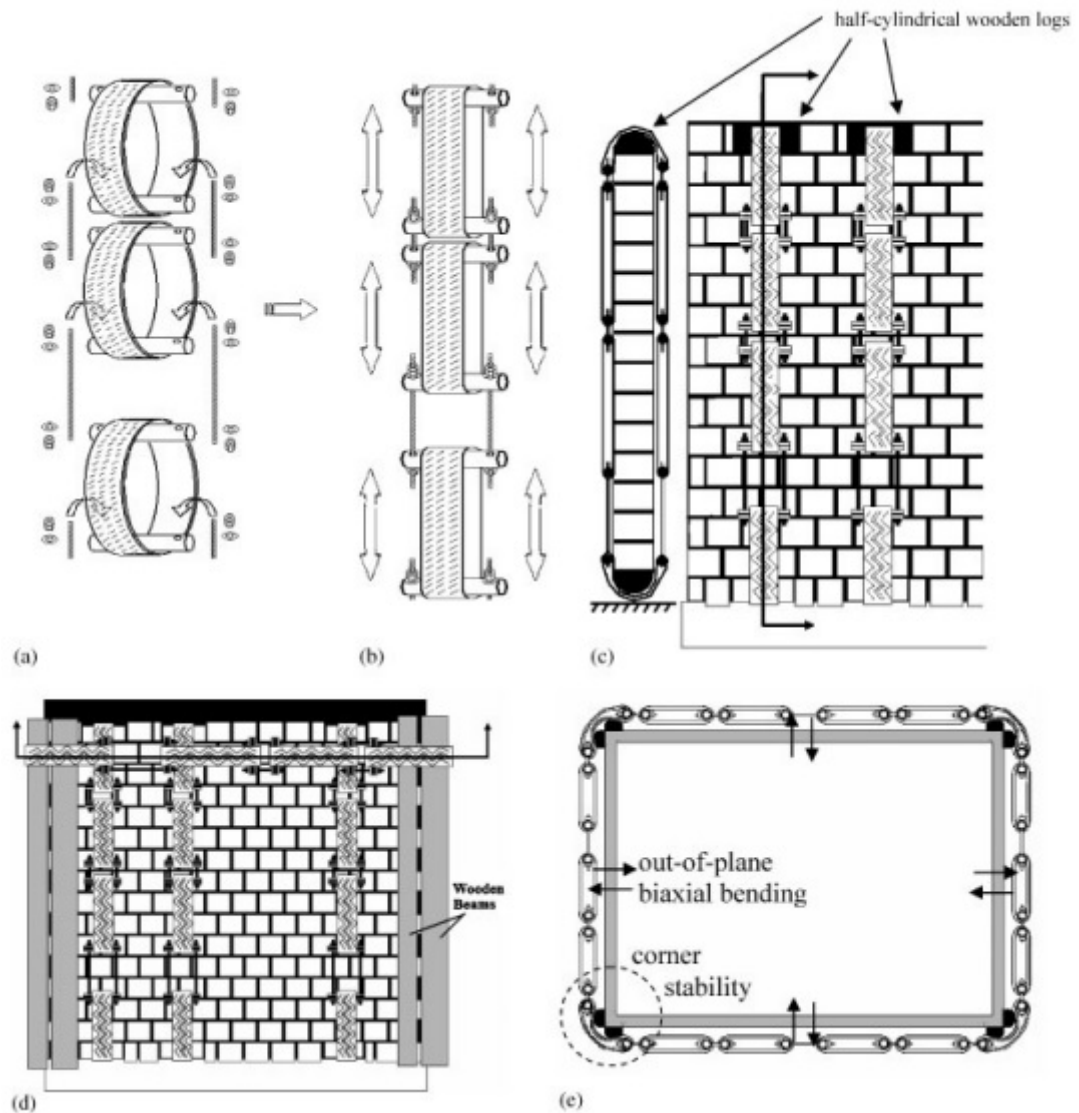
Post tensioning of masonry using rubber tyres [59]
